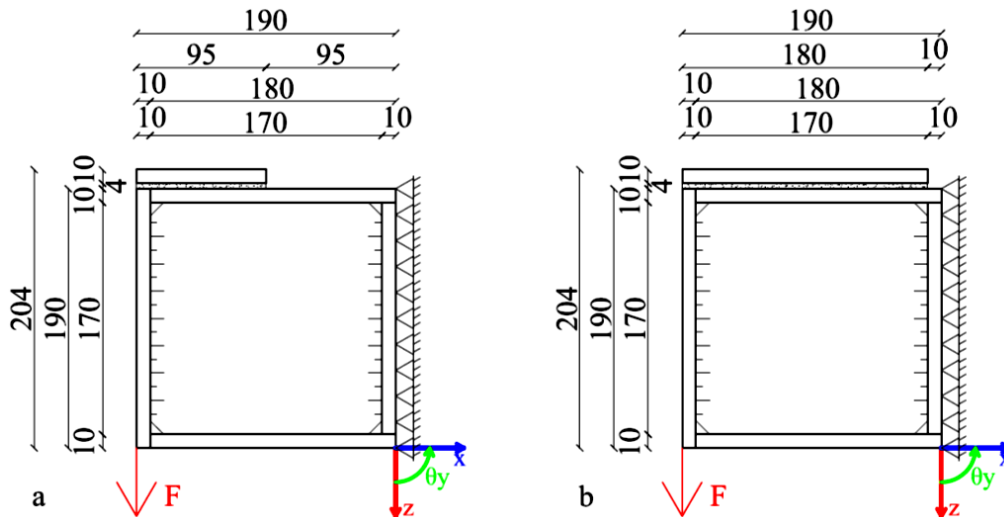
Layout additional FEM tests with a short lap (a) and a long lap (b)
